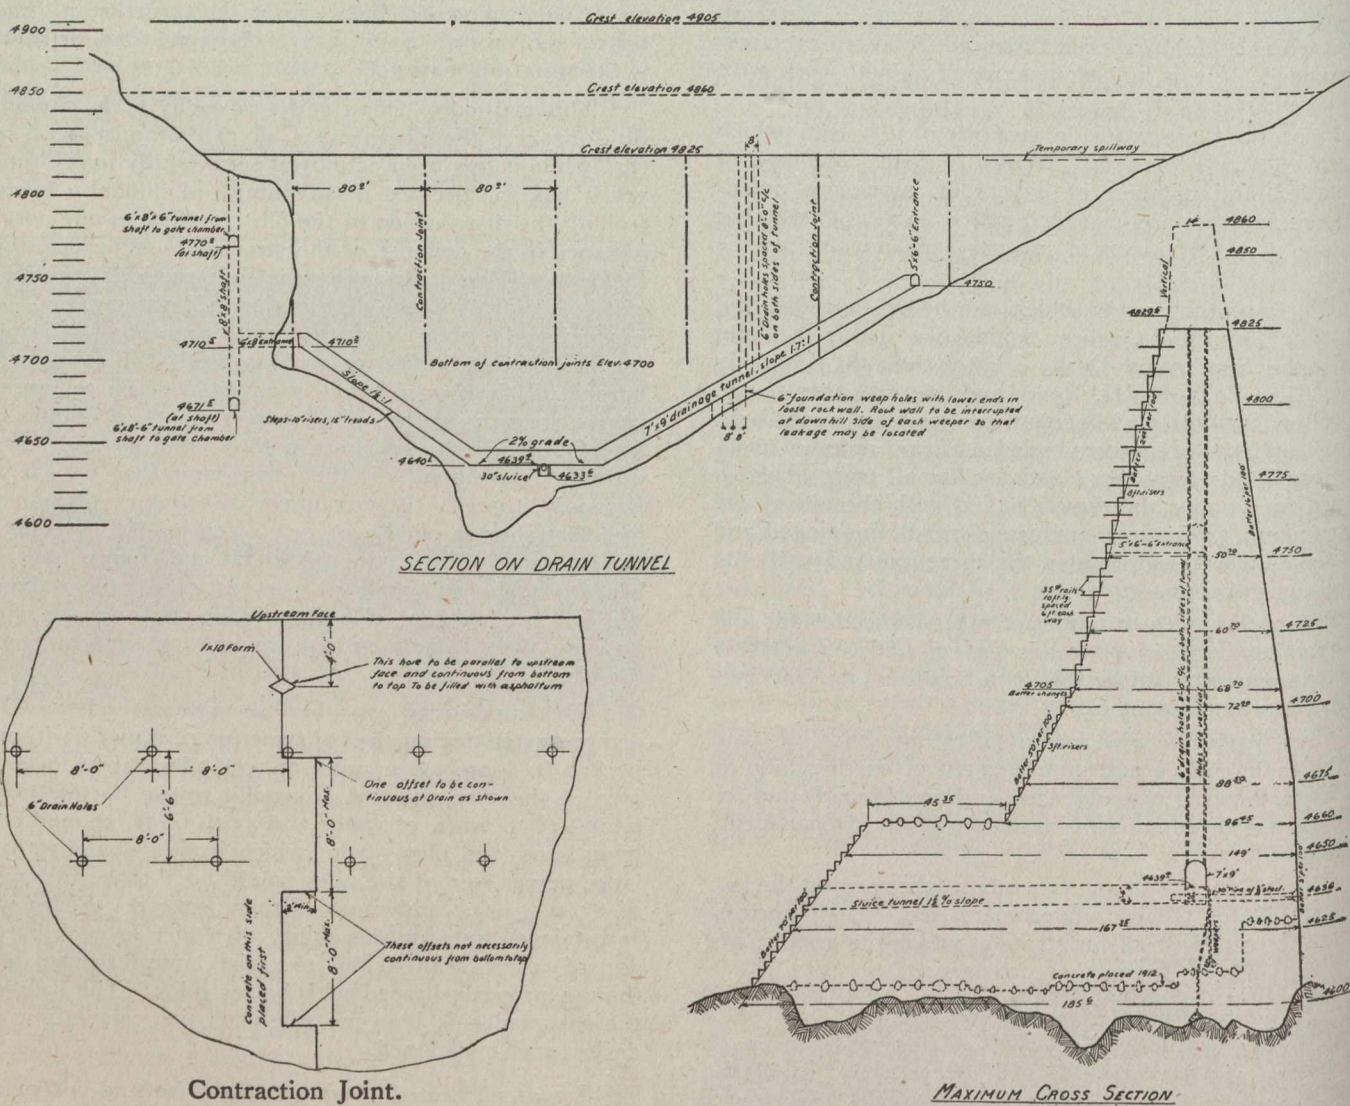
Sections of 225-foot Lake Spaulding Dam.
